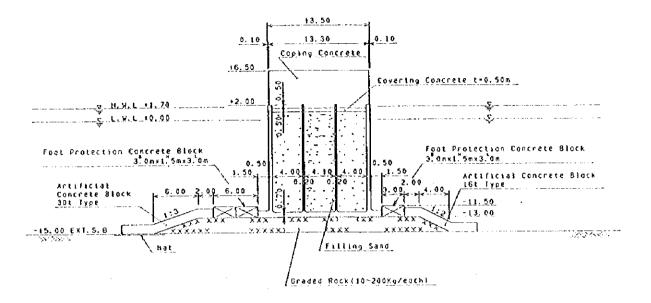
(3) Typical Cross Section of Breakwater 2 (RC Caisson)
